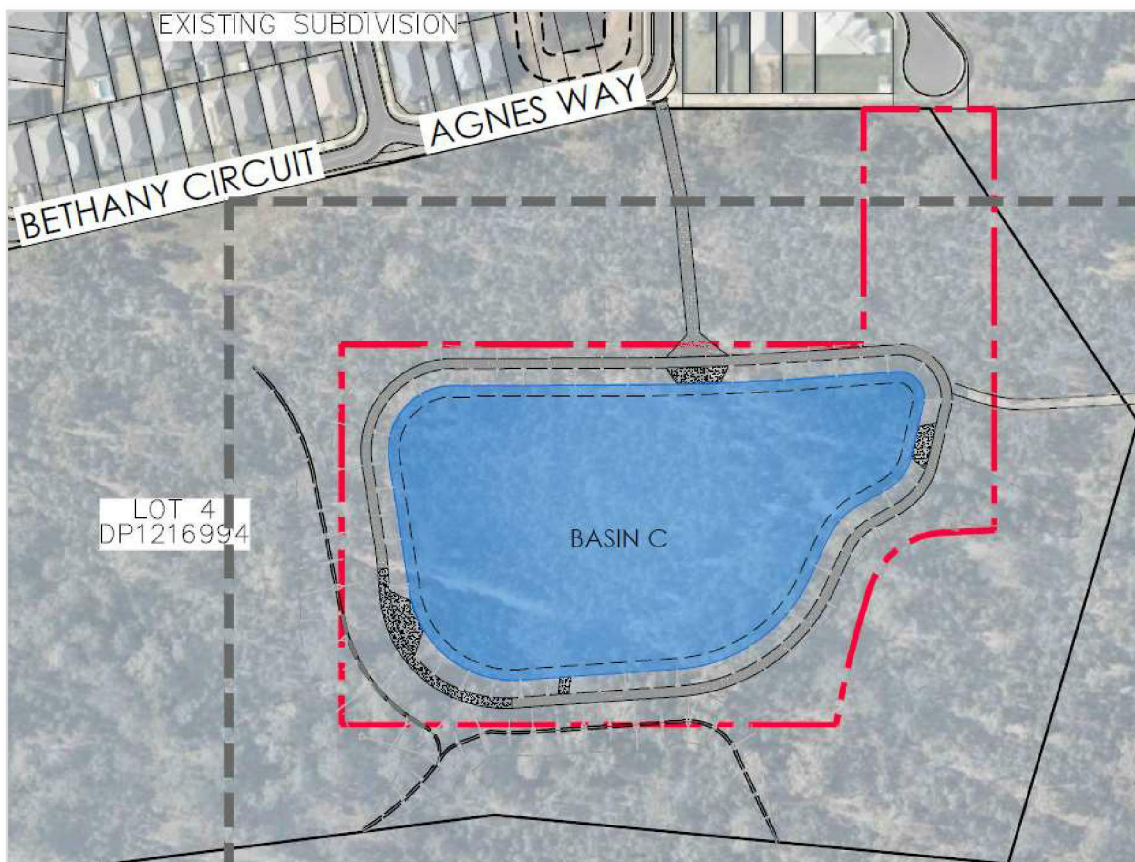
Proposed Basin C layout (Source: ADW Johnson)
